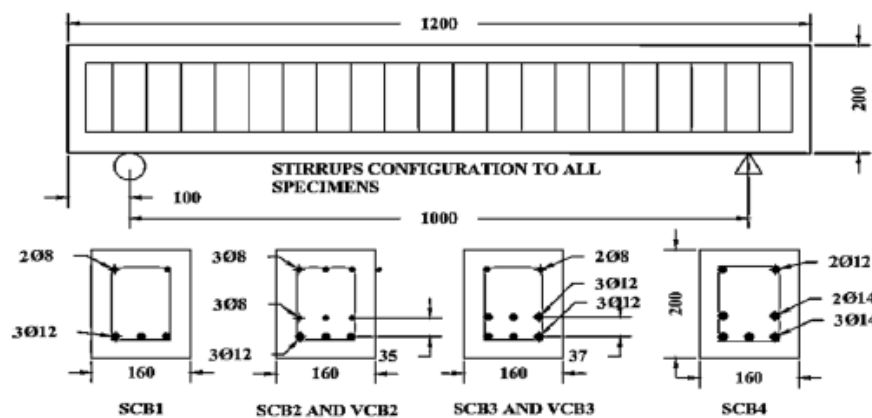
SCC and VC Beams Detailing (Kefelegn and Gebre, 2020).
